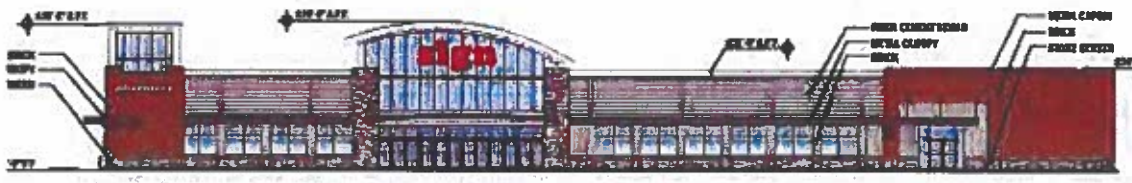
Rendering of Building No. 4 (grocery store), east elevation
